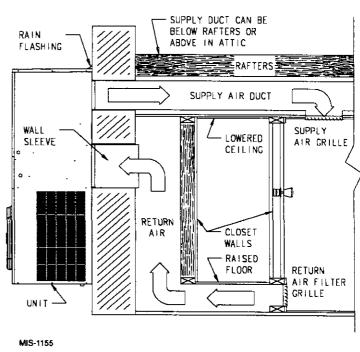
COMMON WALL MOUNTING INSTALLATIONS
